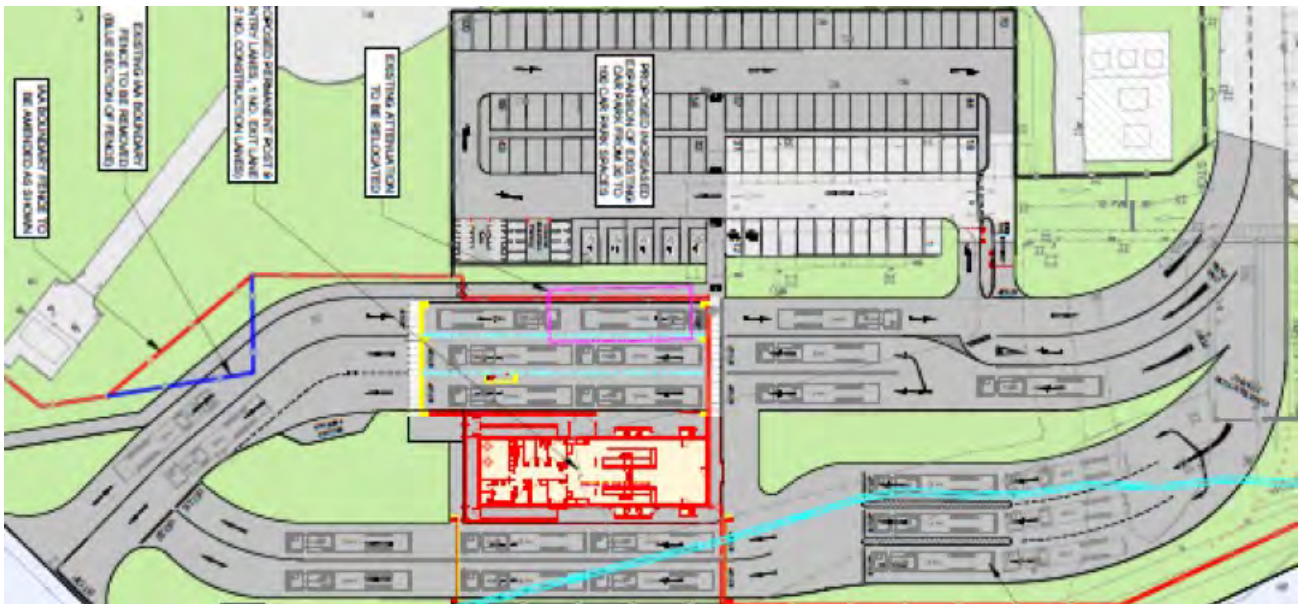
Plan view of the proposed Gate Post 9 layout
